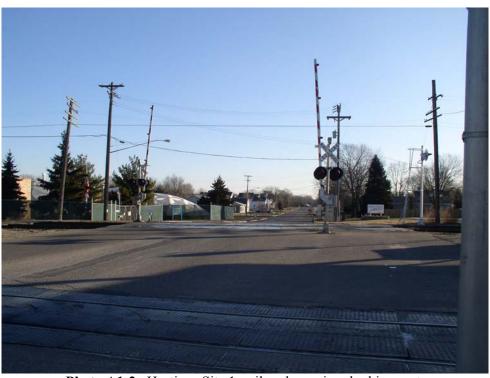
Hastings Site 1; railroad crossing; looking east.
